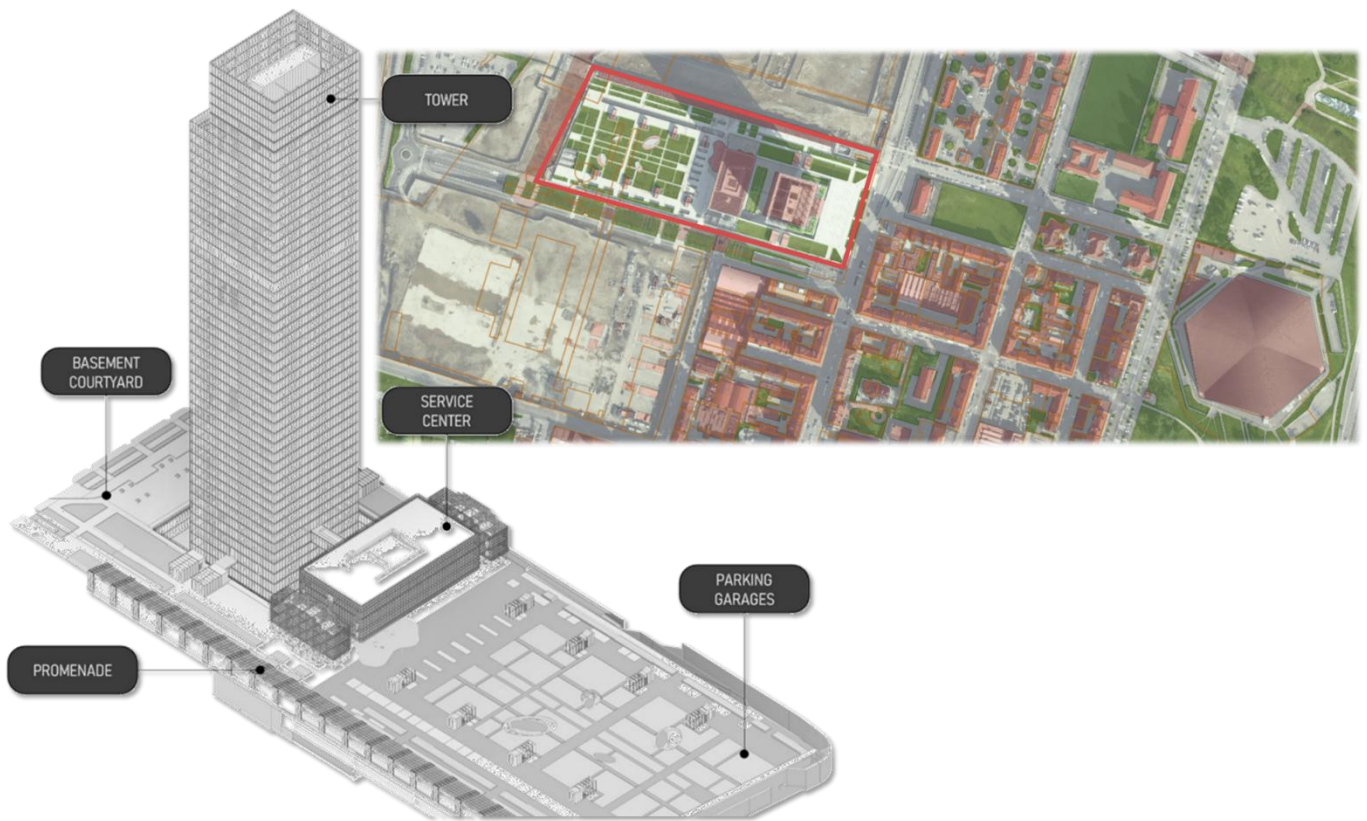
Close -up site plan of the complex and building subdivision of the Palazzo Unico della Regione Piemonte site. [Author's elaboration]
